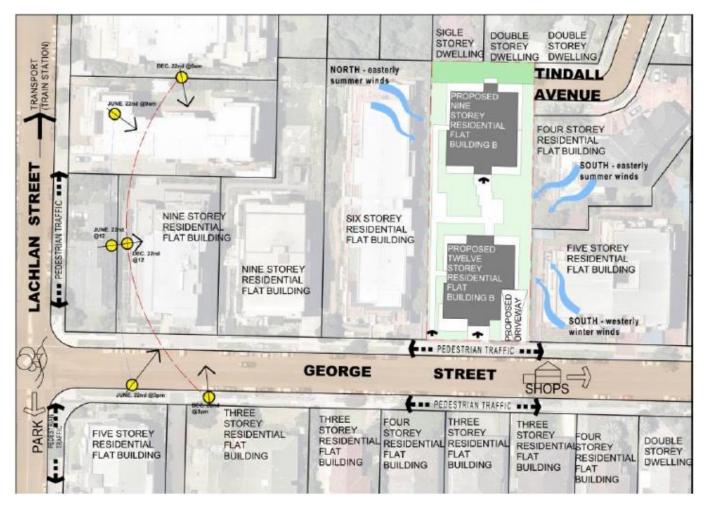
Site analysis extract showing consistency of site coverage, building separation, height and setback with adjoining development.
